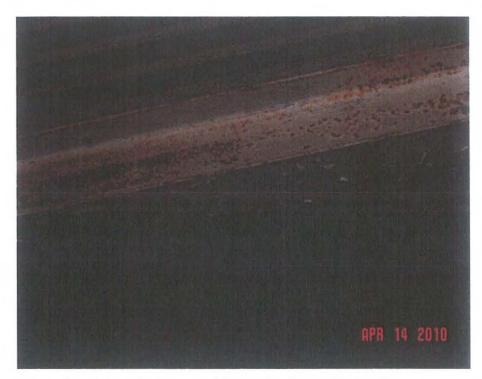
Beam with loose and flaking lead containing paint on beam inside metal building(s) as seen in previous photo.
